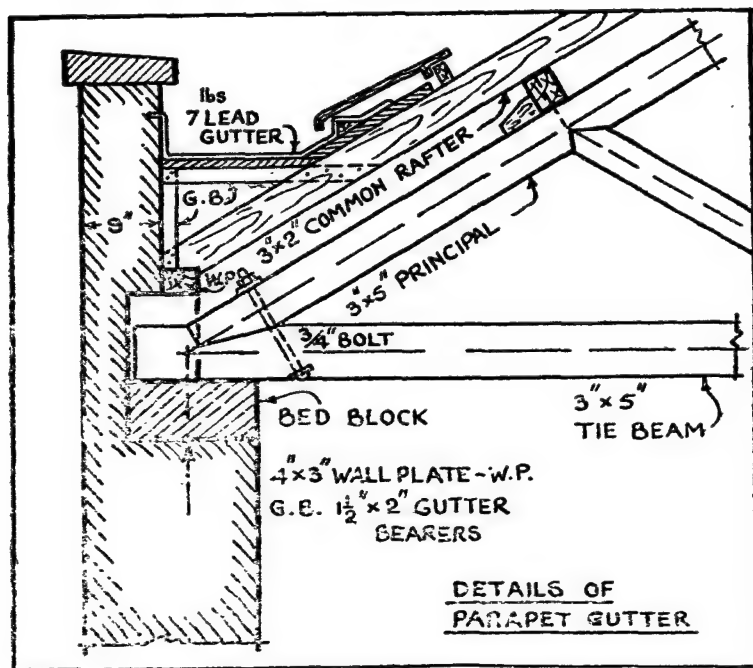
Details of parapet gutter and joint at the foot of truss.
